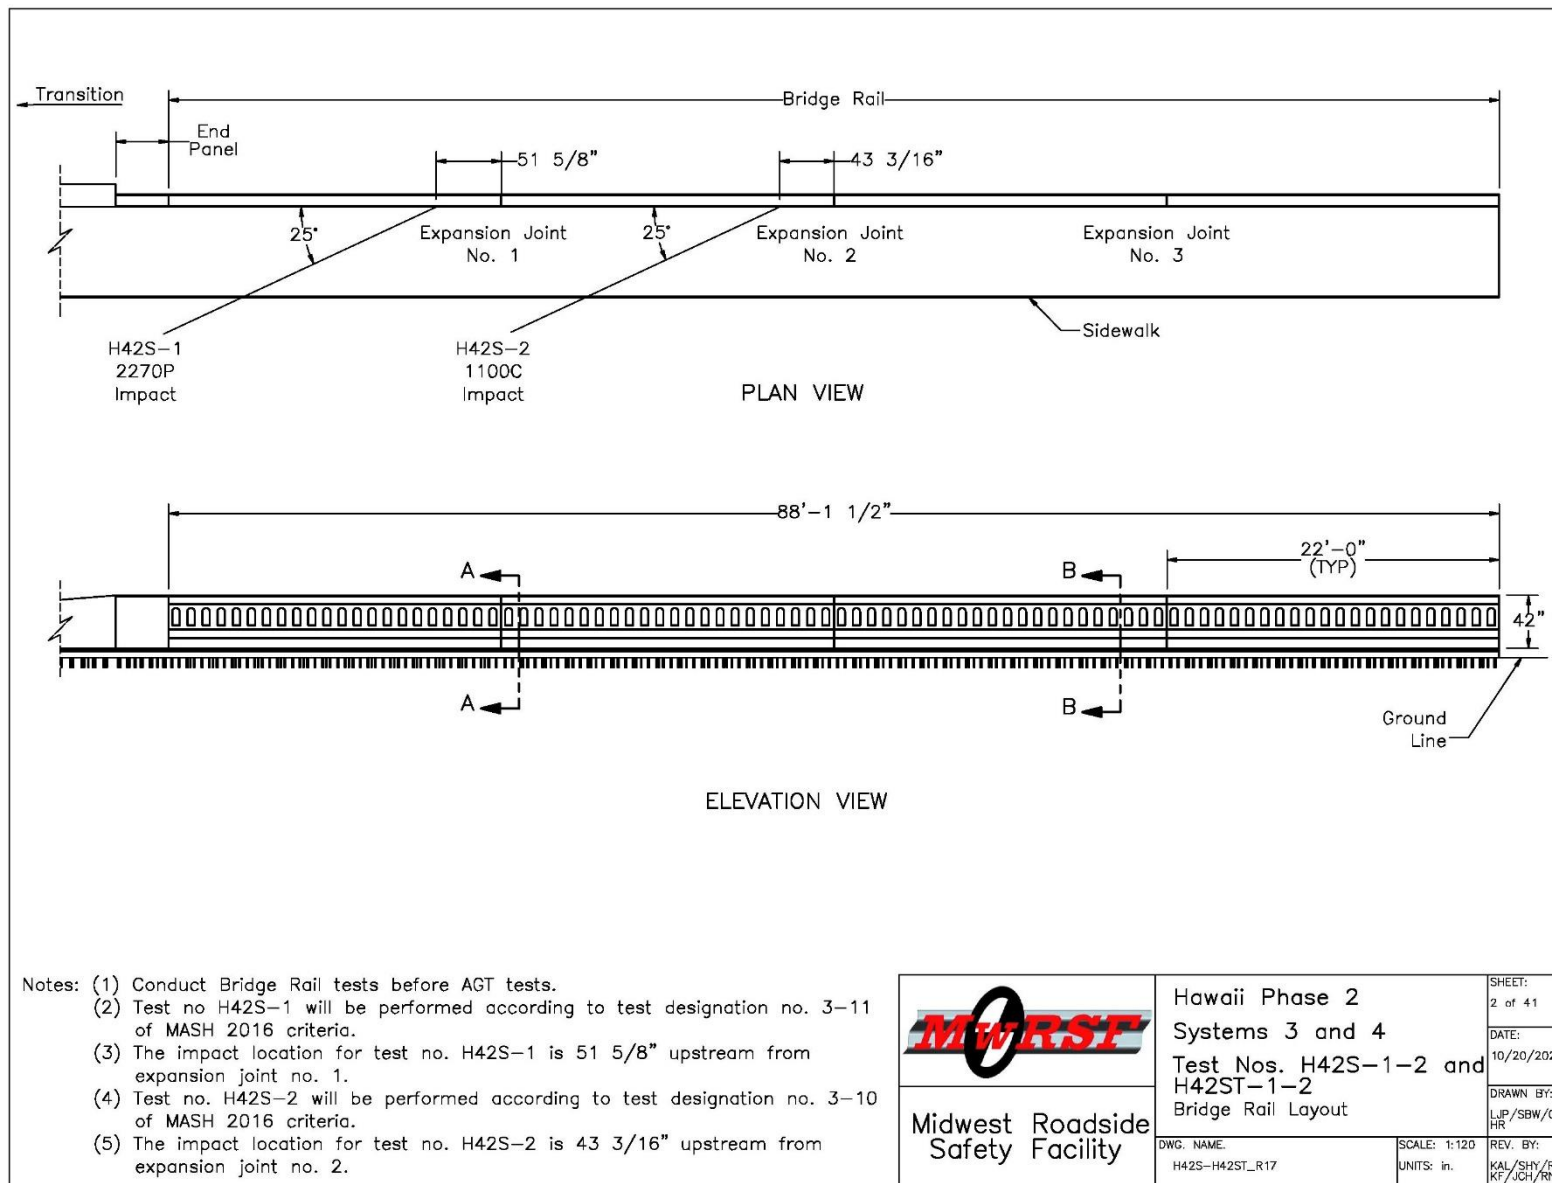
Bridge Rail Layout, Test Nos. H42S-1 and H42S-2
